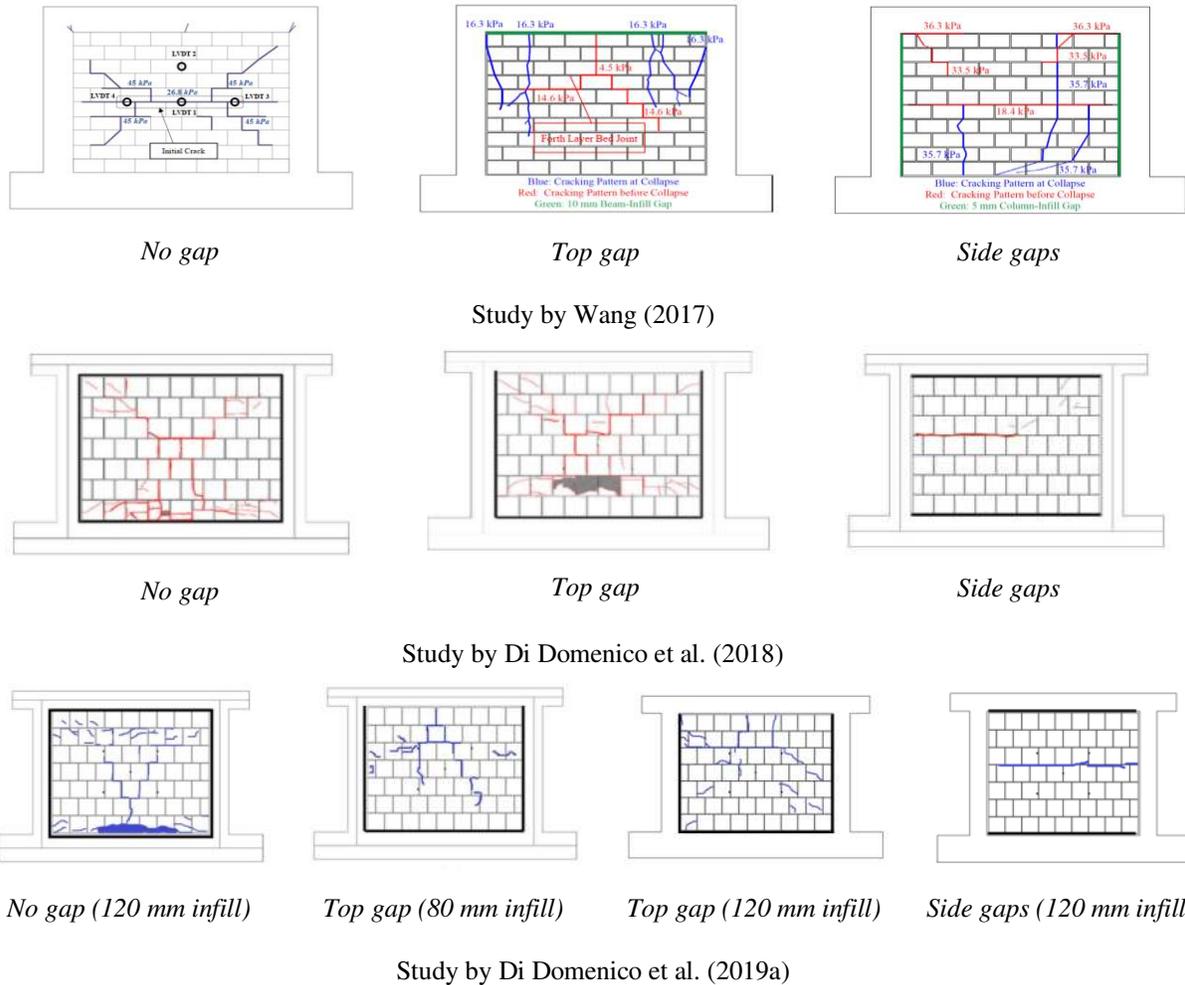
Influence of gaps in cracking pattern of infill walls developed due to an OOP load
